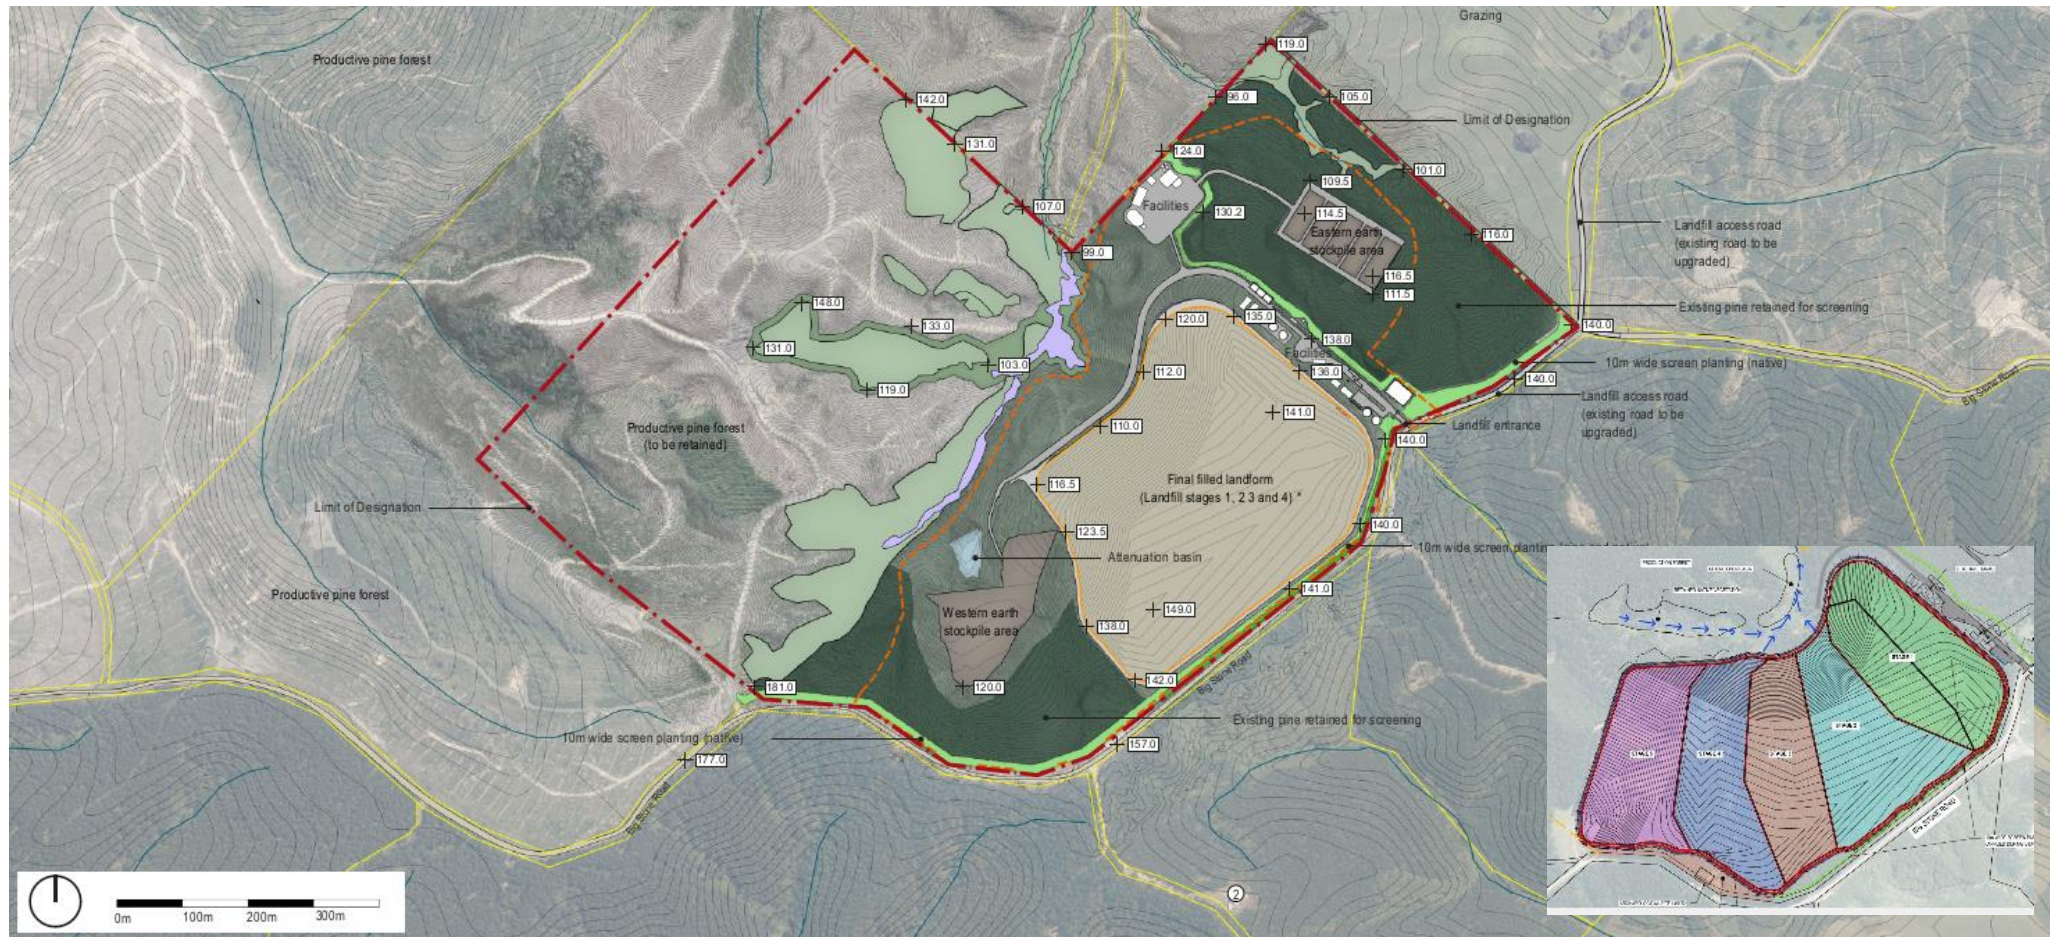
Smooth Hill Landfill – Proposed layout (from Dunedin City Council, 2021)
